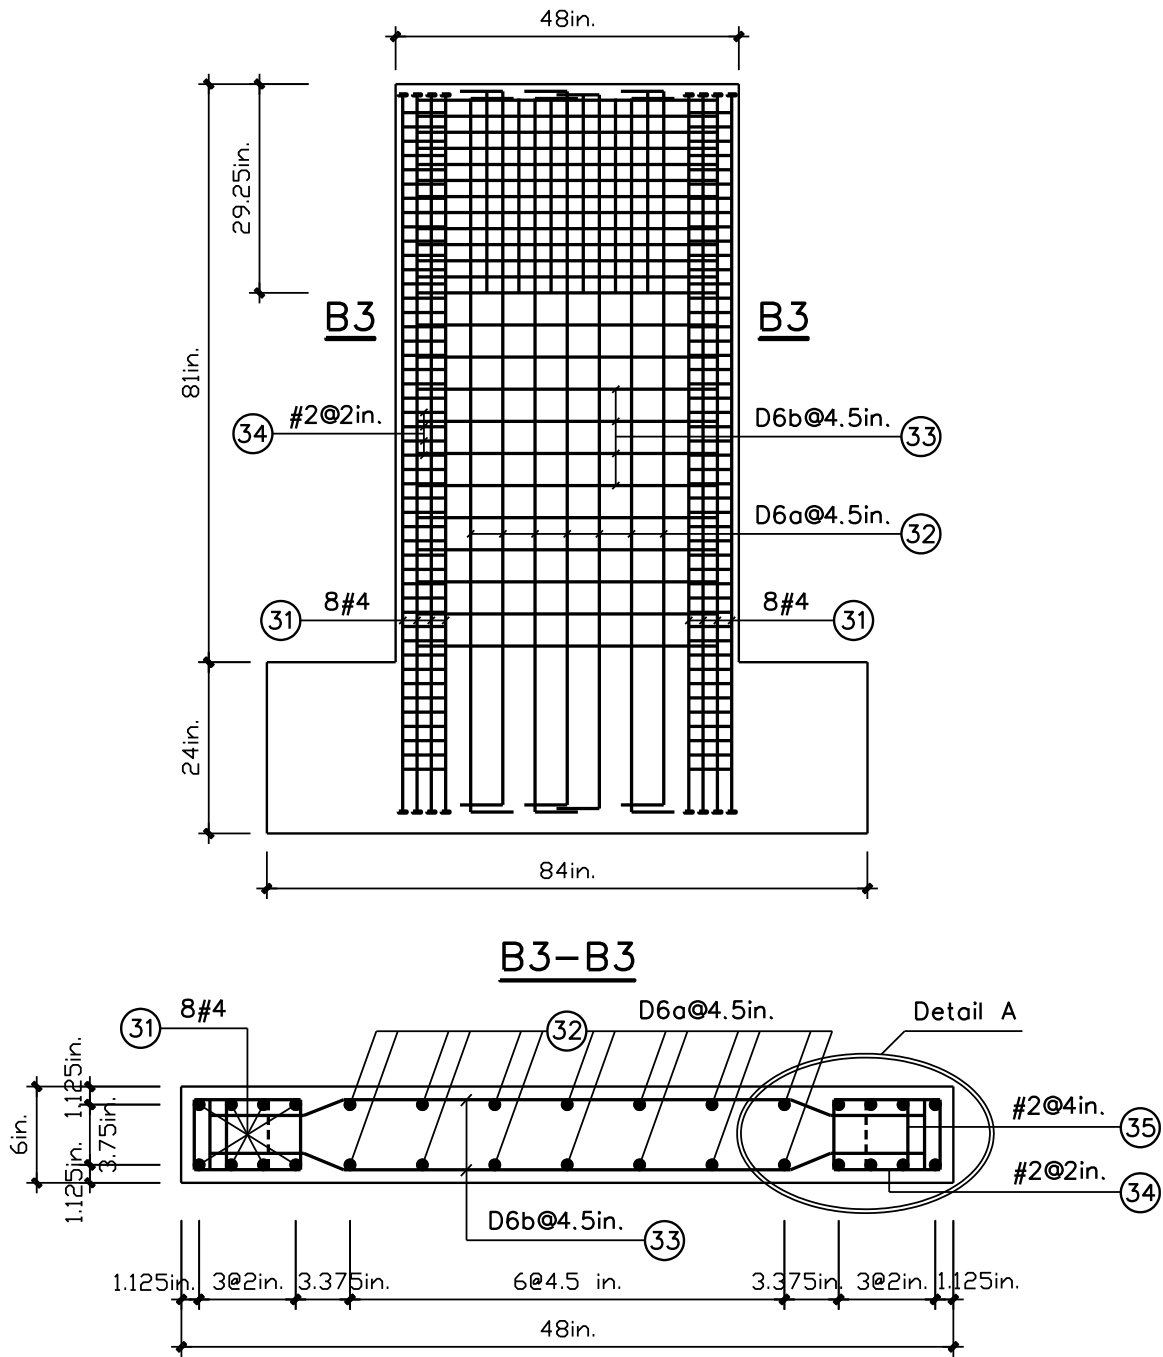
Reinforcement details for RW-A15-P10-S51
